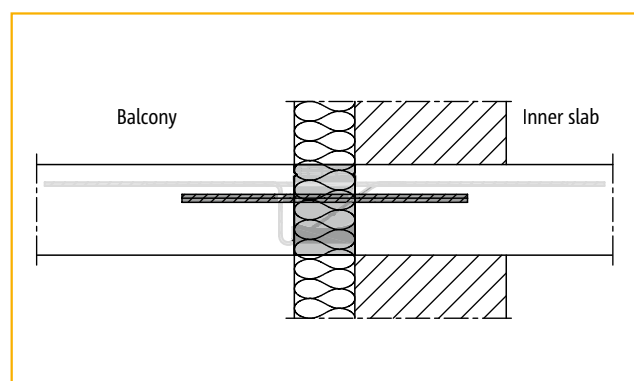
Brickwork with external insulation and a balcony at inner slab level + type KXT + HPXT-A module
